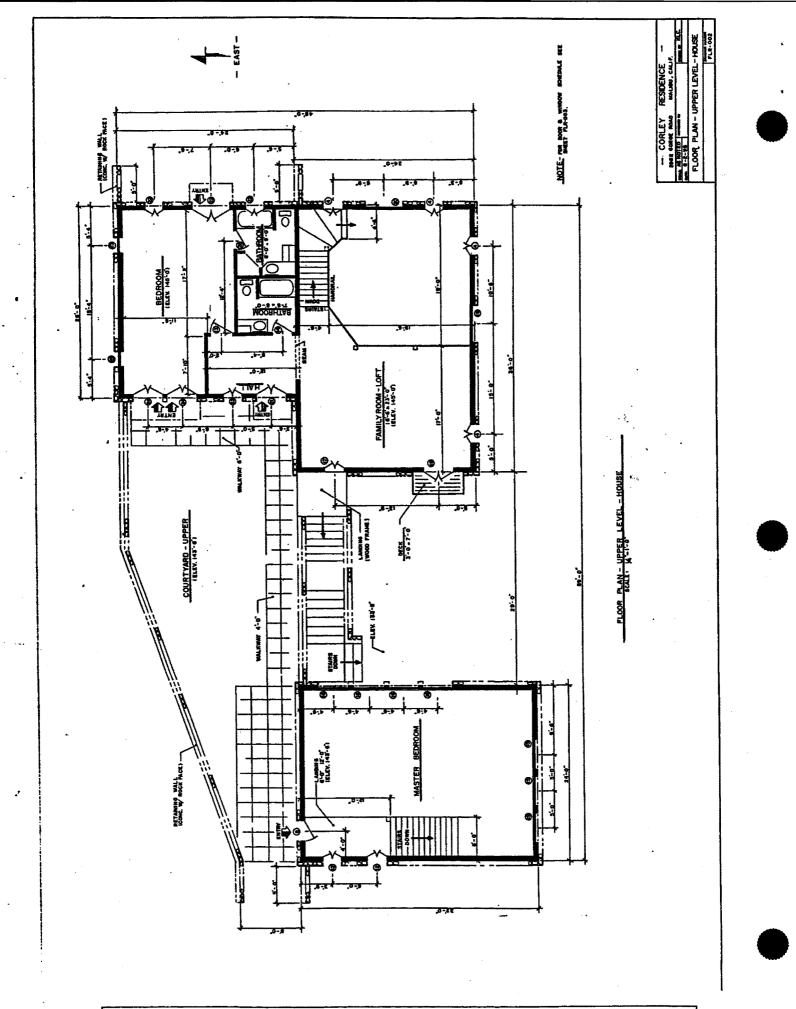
CDP 4-97-067 (Corley) Floor Plan- Upper Level
